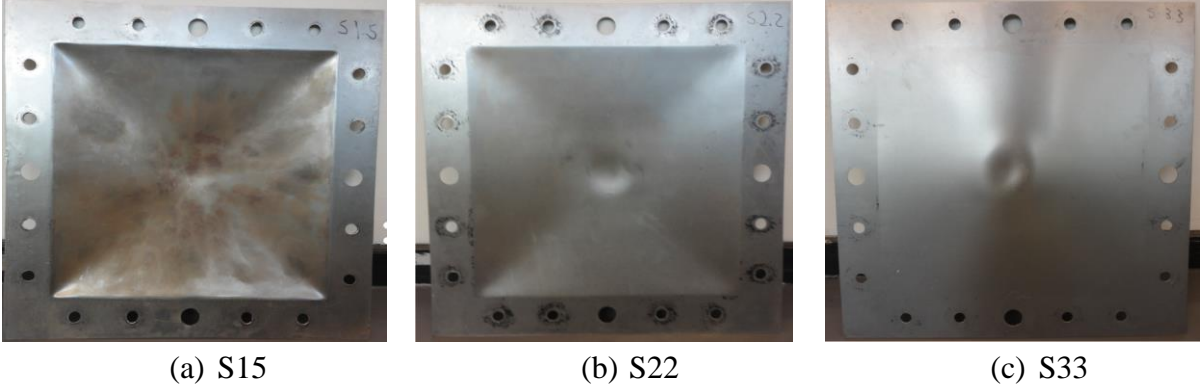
Photographs of deformed shapes for selected steel plates (seen from the explosive charge).
